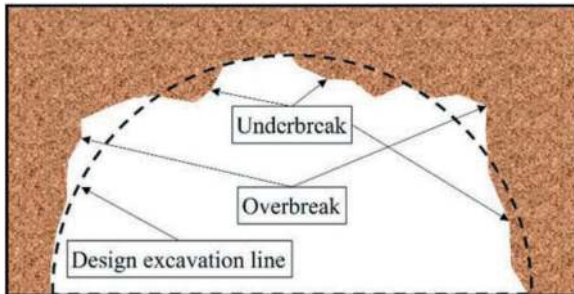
Tunnel forms of overbreak and underbreak after blasting excavation.
